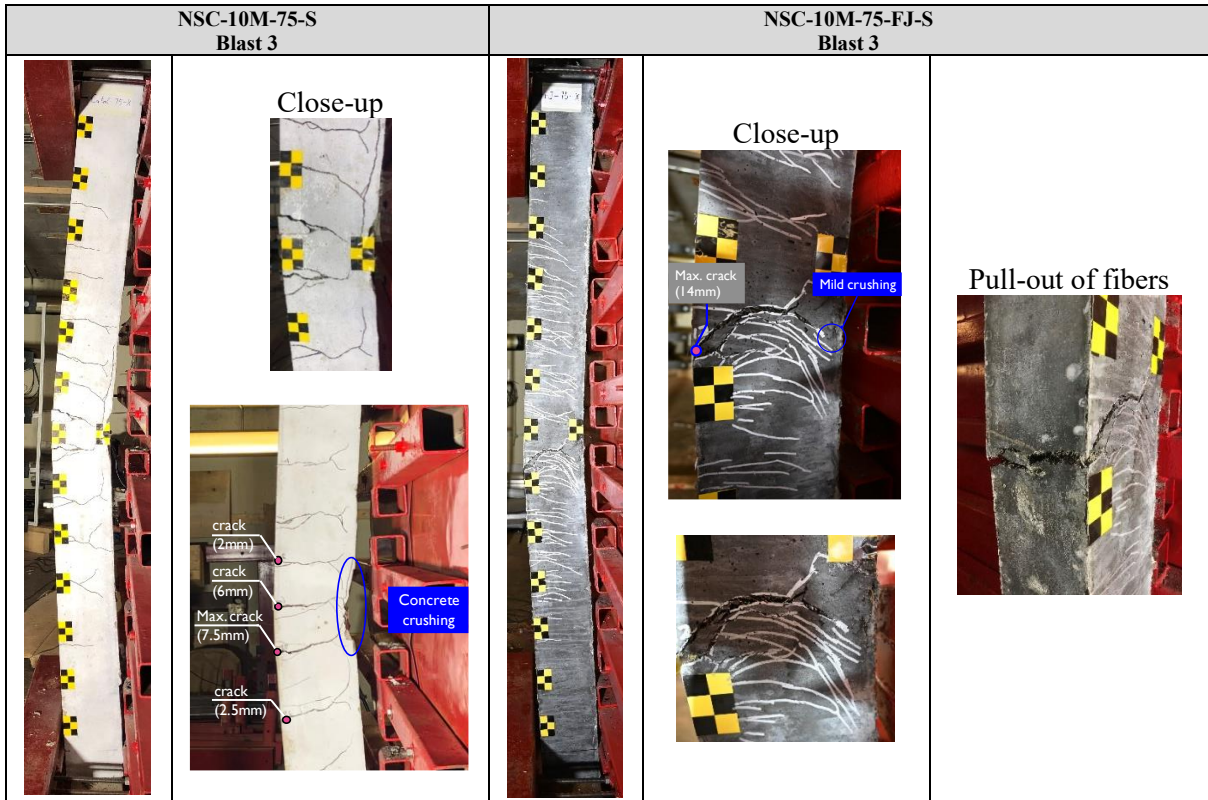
11 Progression of damage in beams under single blast loading (Blast 3)
